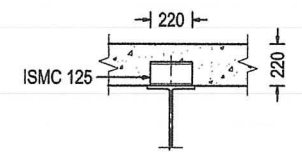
SHEAR CONNECTORS ALONG END CROSS GIRDER
